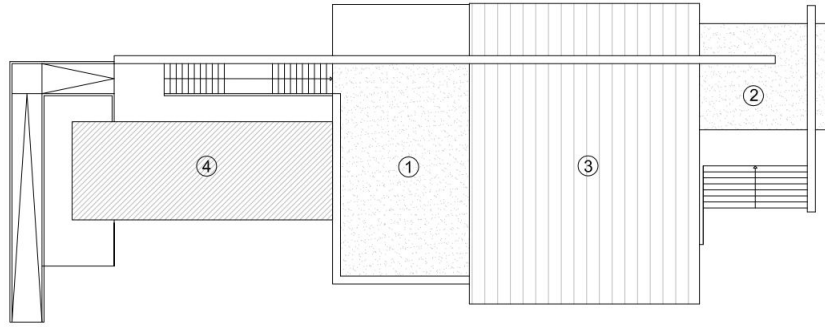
Ground Floor: educational and external areas and reinforced concrete septum
